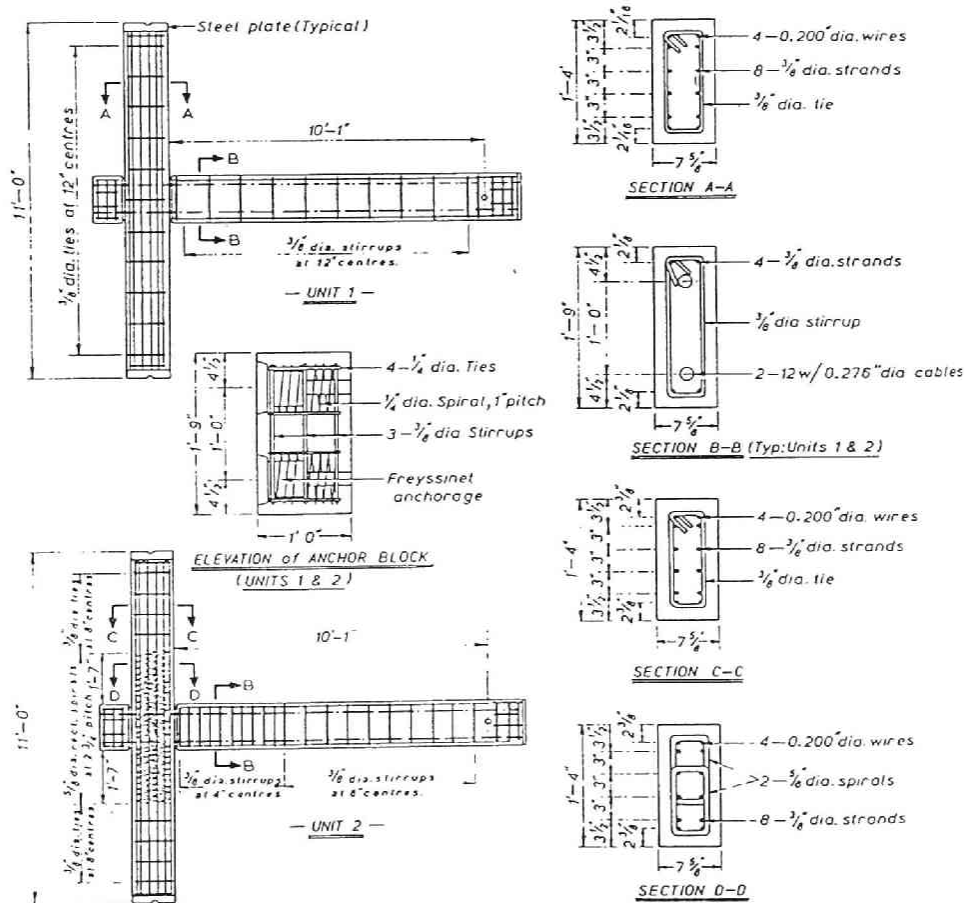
(a) Precast prestressed concrete beam - column assembly test units (Units 1 and 2) by Blakeley and R. Park [4.1]
